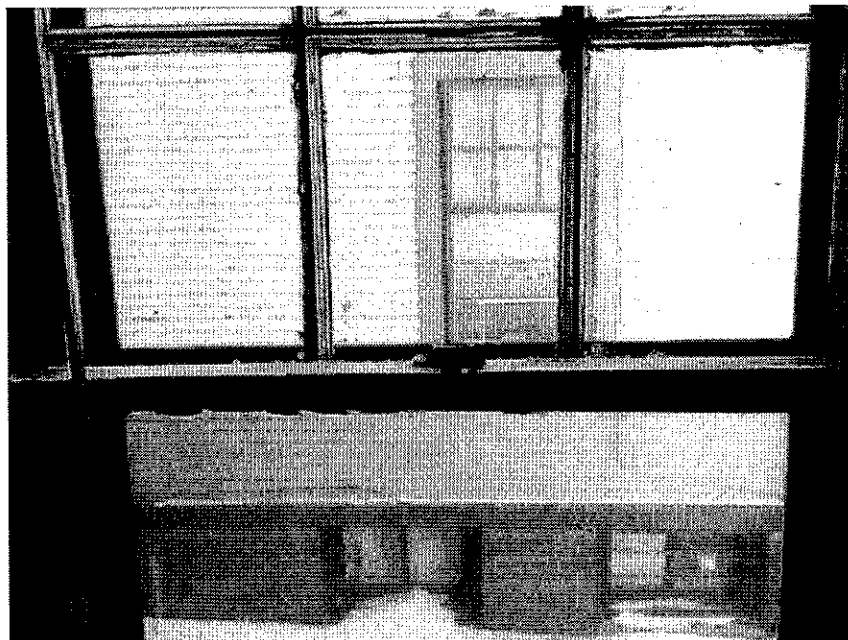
Marvin Wood Ultimate Insert Double Hung Windows to be used on the north, south, and west elevation (this window installed at 1003-05 North 33rd Street).
